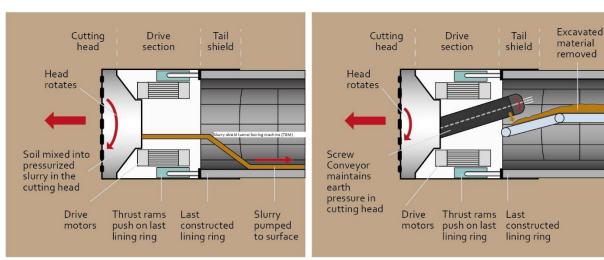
Cross-section of a slurry shield tunnel boring machine and earth pressure balance machine
